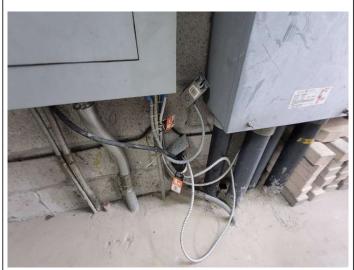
Item 5.1.a. Meter Electrical Room. All temporary wiring and receptacles must be removed.
